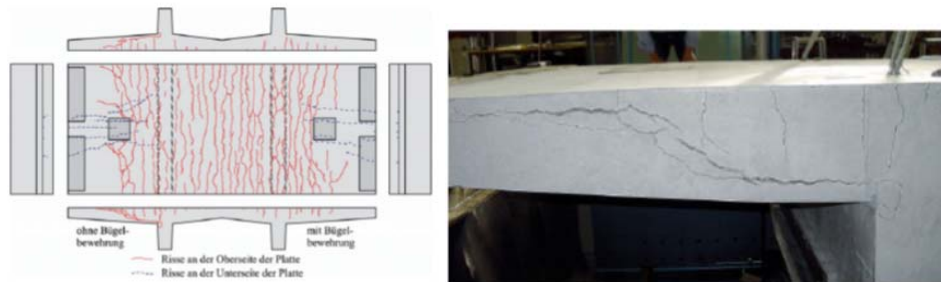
Crack pattern of test specimen VK1 after loading (Rombach and Latte, 2009).
